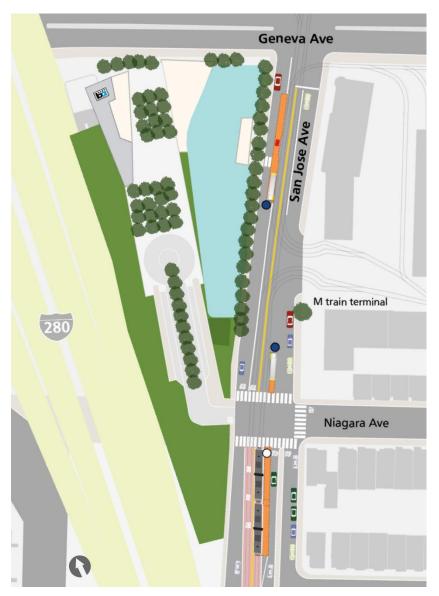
Proposed improvements near the intersection of San Jose and Geneva avenues
